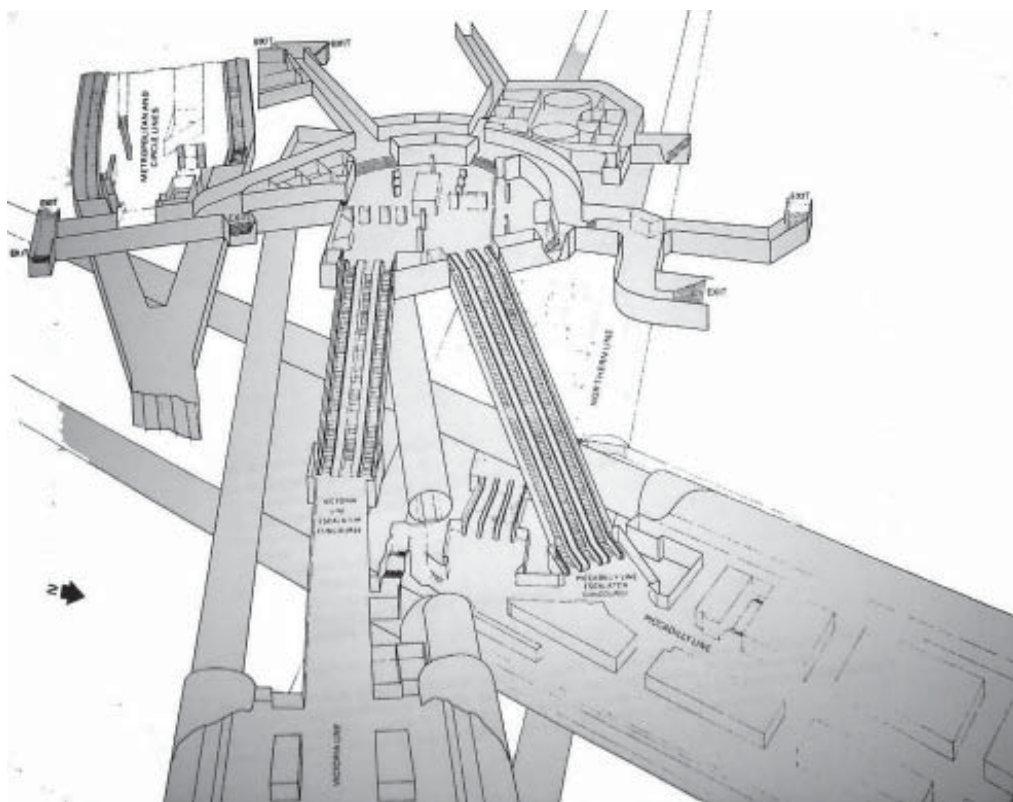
Architecture of Ticket hall at King's Cross Underground station (LUL 1996)
